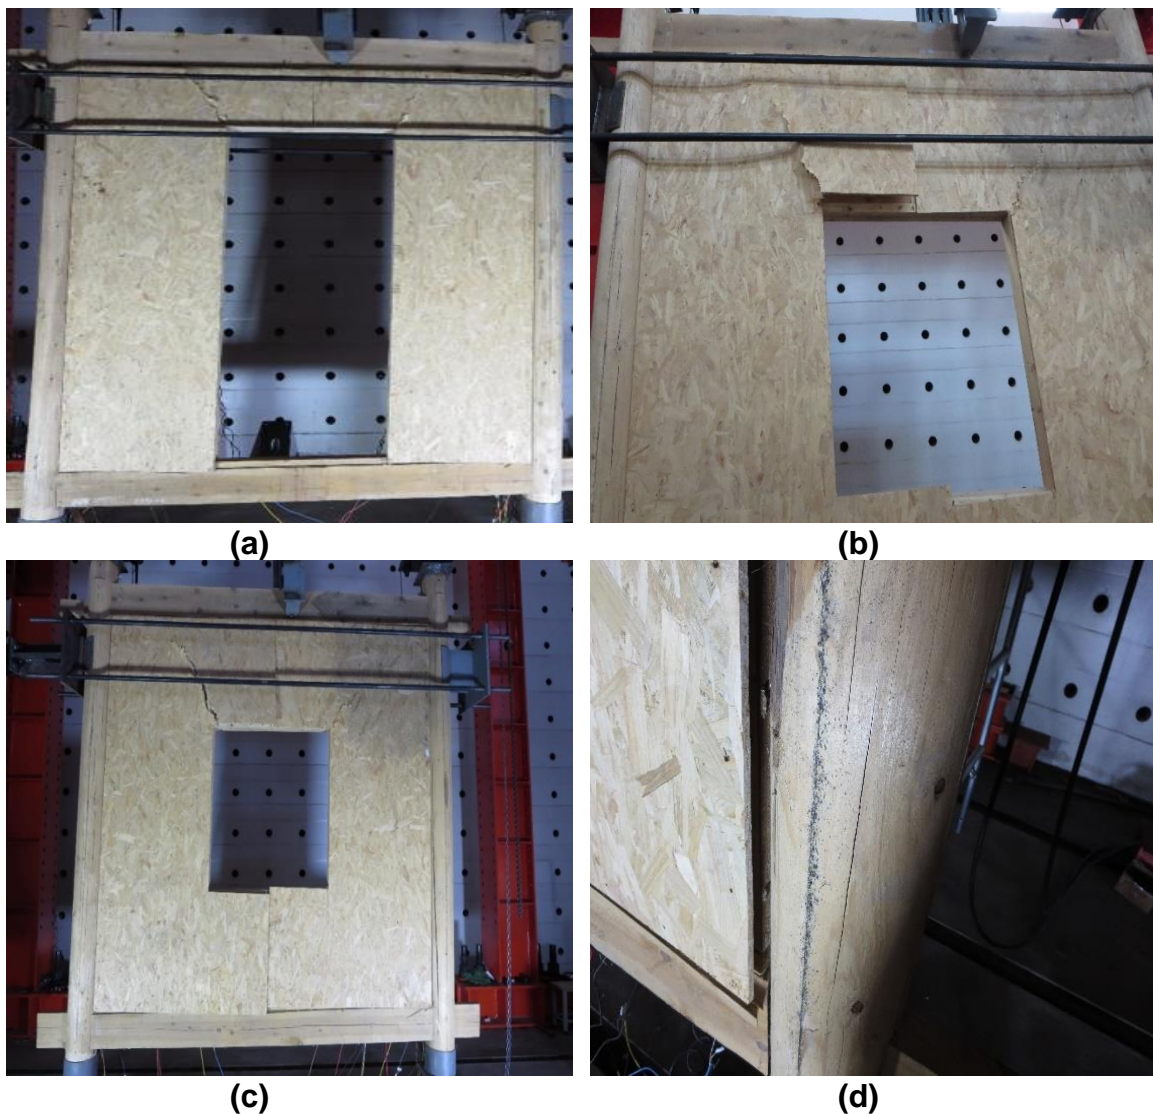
Typical failure modes of specimen: (a) Diagonal cracks at the top of the door opening; (b) Diagonal cracks on the upper part of the window opening; (c) OSB board misalignment; (d) The nails penetrated through the sheathing panel
